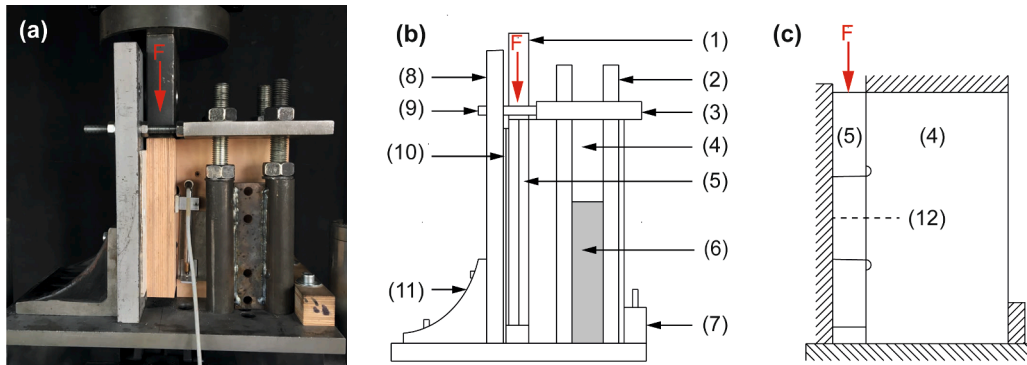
Side view of the shear experimental setup for TT connections: (a) Photograph/ (b) Technical drawing: (1) Steel plate 40 mm, (2) Bolt Ø24 mm, (3) Steel plate 15 mm, (4) Specimen with tenon, (5) Specimen with mortise, (6) Steel plate 5 mm, (7) Beech LVL 40 mm, (8) Steel plate 20 mm, (9) Bolt Ø12 mm, (10) Two Teflon plates, (11) Steel bracket 20 mm with 8 bolts Ø12 mm/ (c) Schematic drawing: (12) Two LVDTs sensors.
